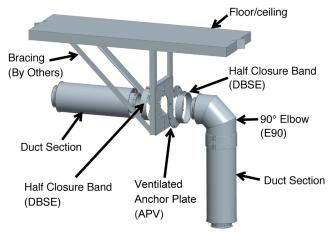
Elbow with a Ventilated Anchor Plate (APV)
